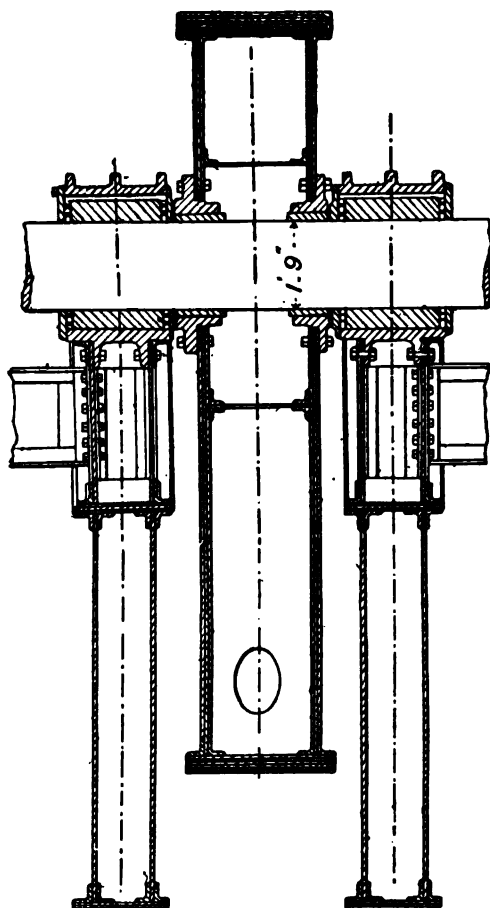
Section through Bascule and Pivot of Tower Bridge.
